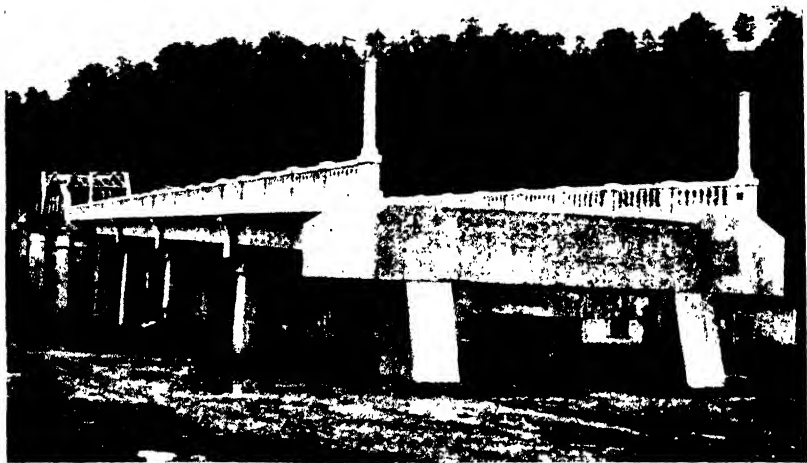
Showing Buried Type of Abutment. (Courtesy of L. L. Jemison, Bridge Engineer, State Road Commission of West Virginia.)
